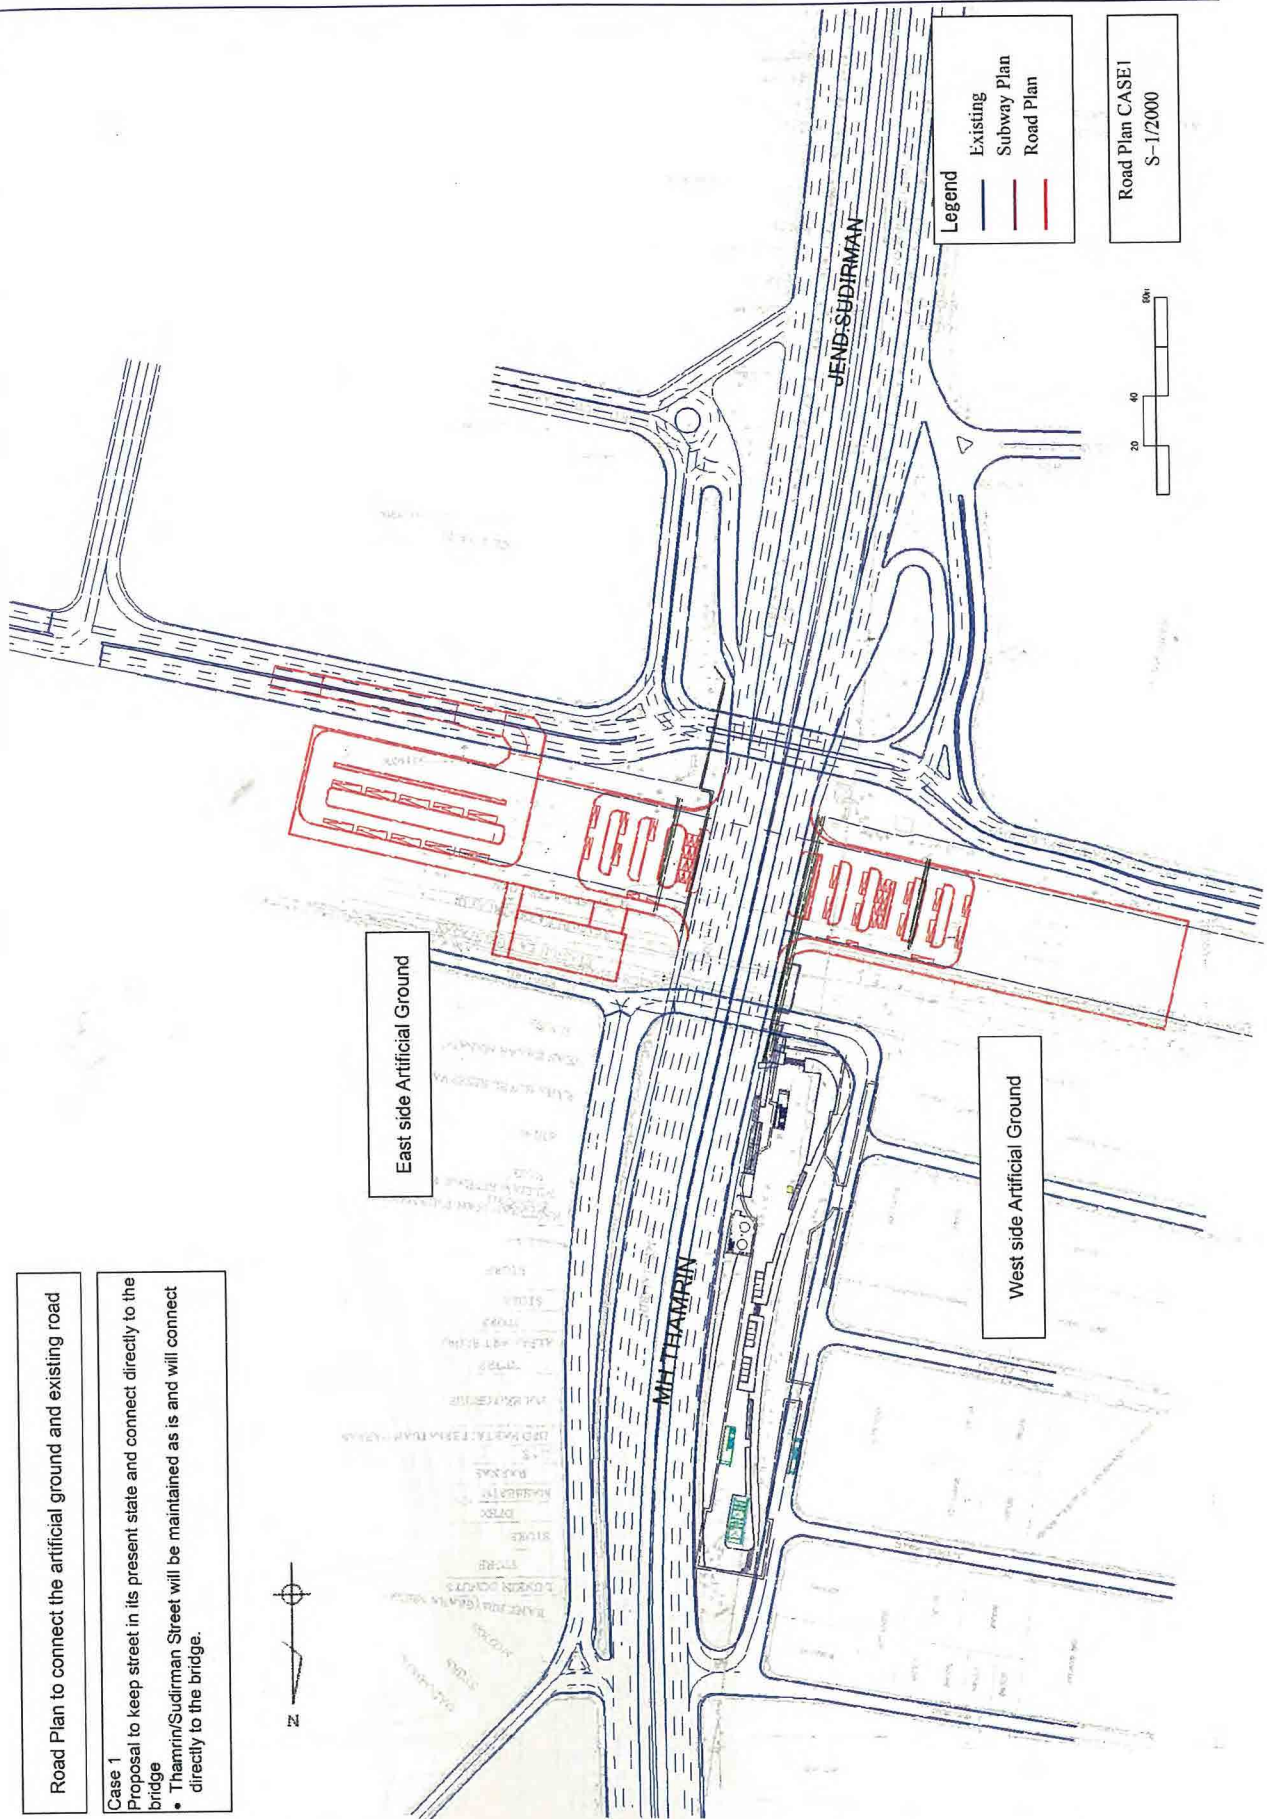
Proposed Connection with Artificial Ground: Case 1
